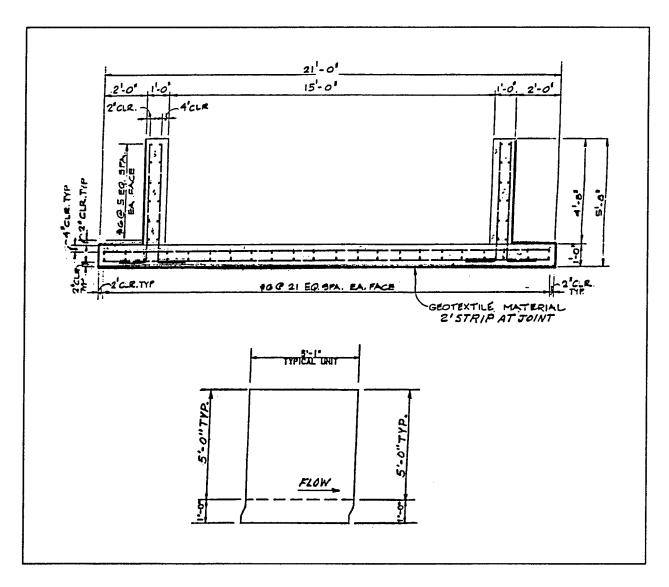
Typical Blue River Paved Reach precast concrete U-flume section
